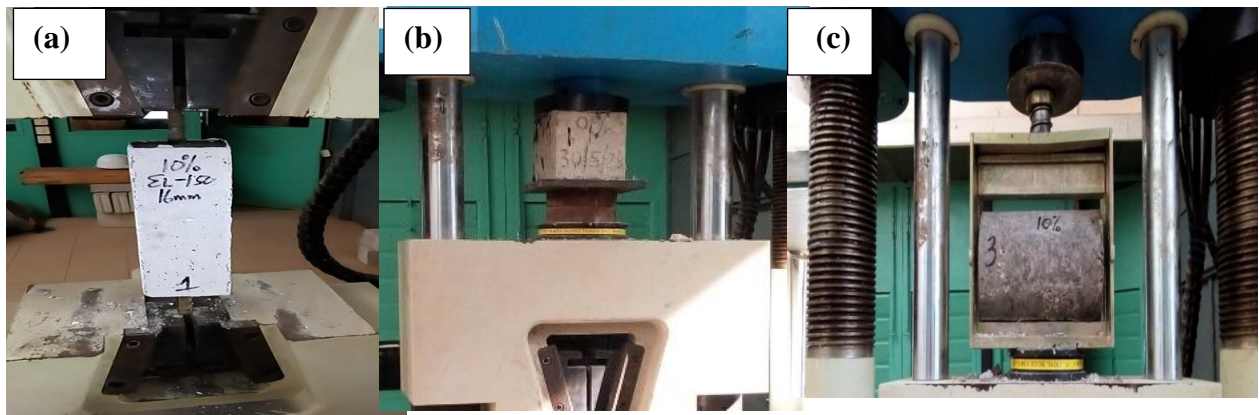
Testing of specimens using UTM: (a) Anchorage bond strength (double pull-out) test, (b) compressive strength test, (c) splitting tensile strength test.
